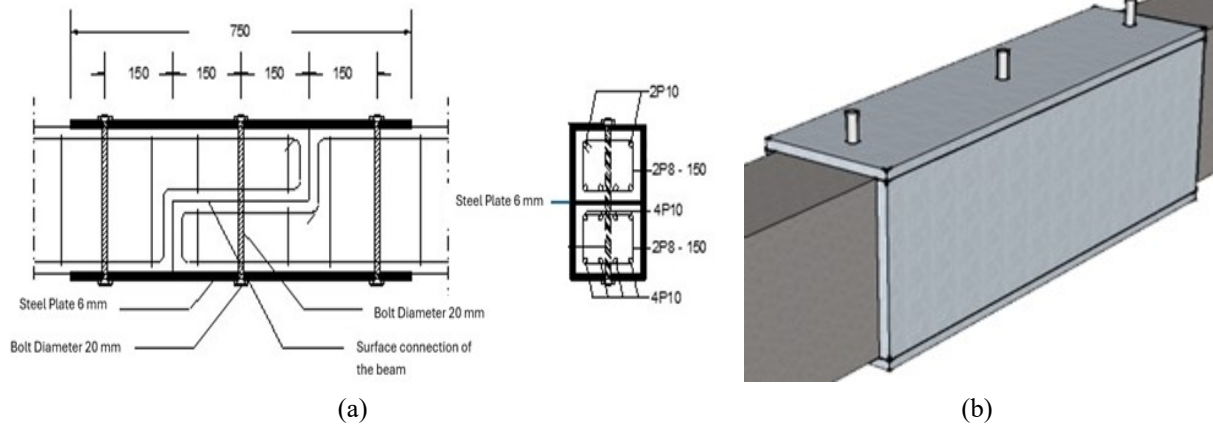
The detailing of fully steel plate covering at the connection of the BC-2 (unit in mm)
